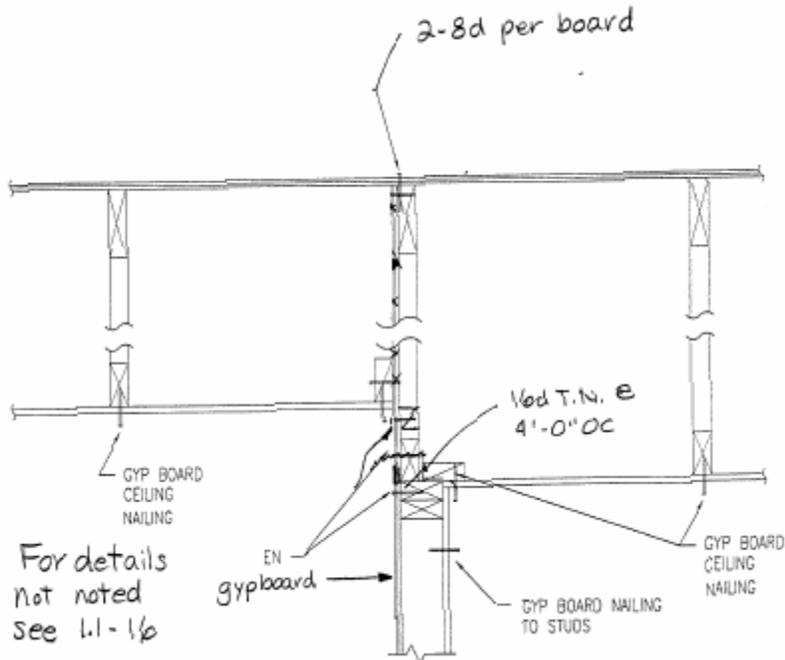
Index building 4 master bedroom roof high ceiling (detail 3-S2)
